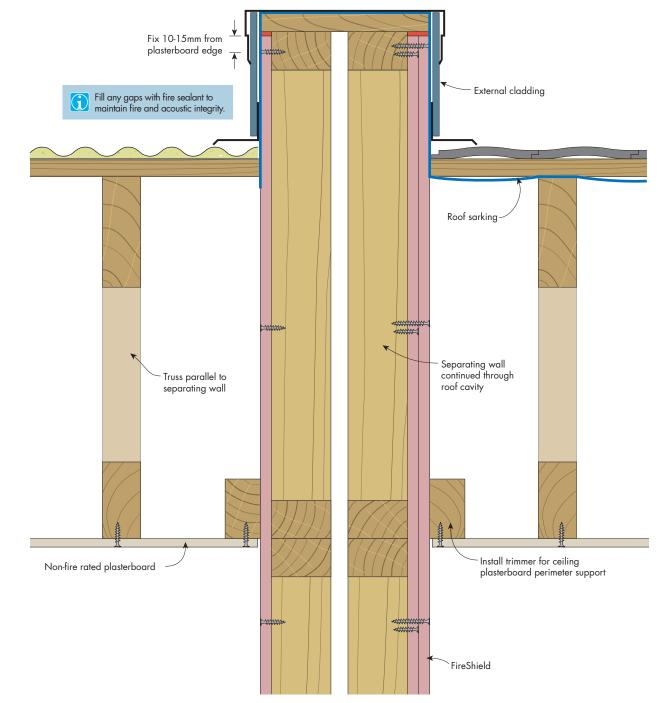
Separating Wall to Parapet Roof with Parallel Roof Trusses
